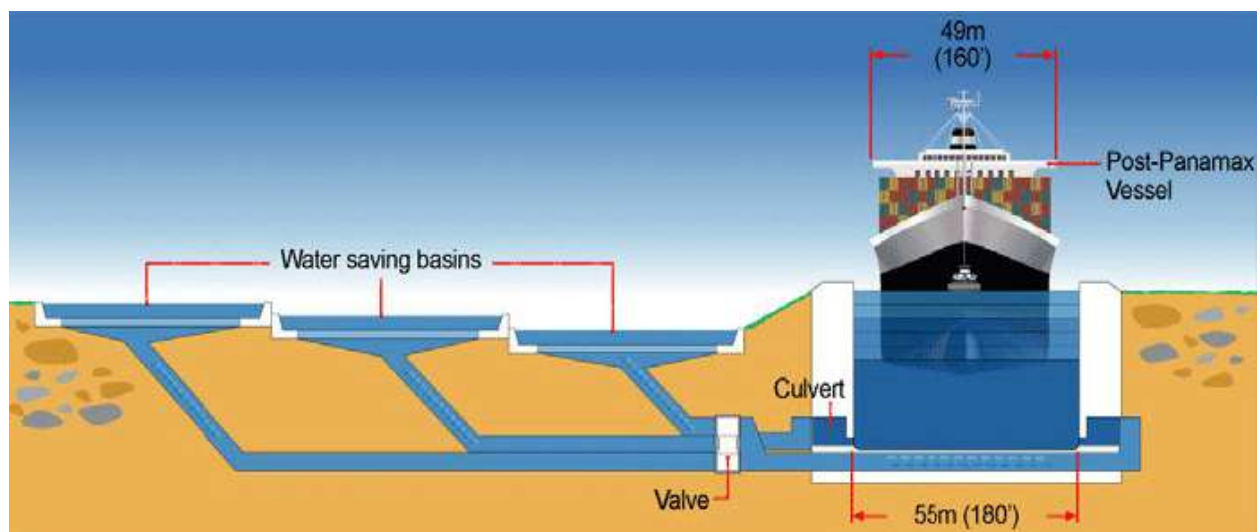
Cross Section View of New Locks with Water Saving Basins (Panama Canal Authority, 2006)
